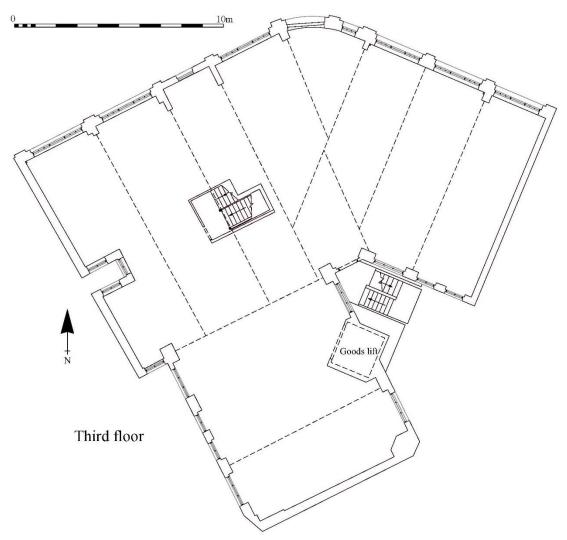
Third floor plan Modified from drawing supplied by client. See also Figure 74
